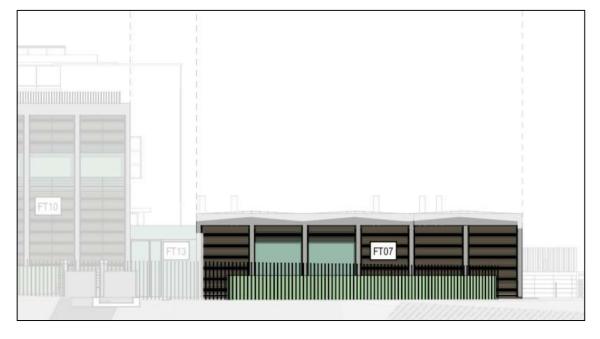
Building F Southern Elevation (Source: FJMT, DA-5906, 18.12.19)
